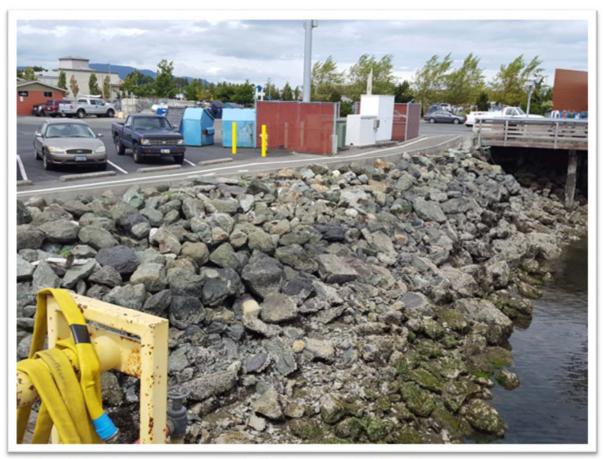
Protective stone revetment barrier looking northwest (see Figure 1).
